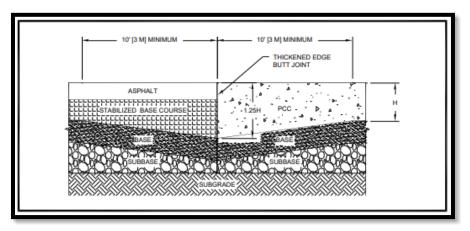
Transition between Rigid and Flexible Pavement Sections.
